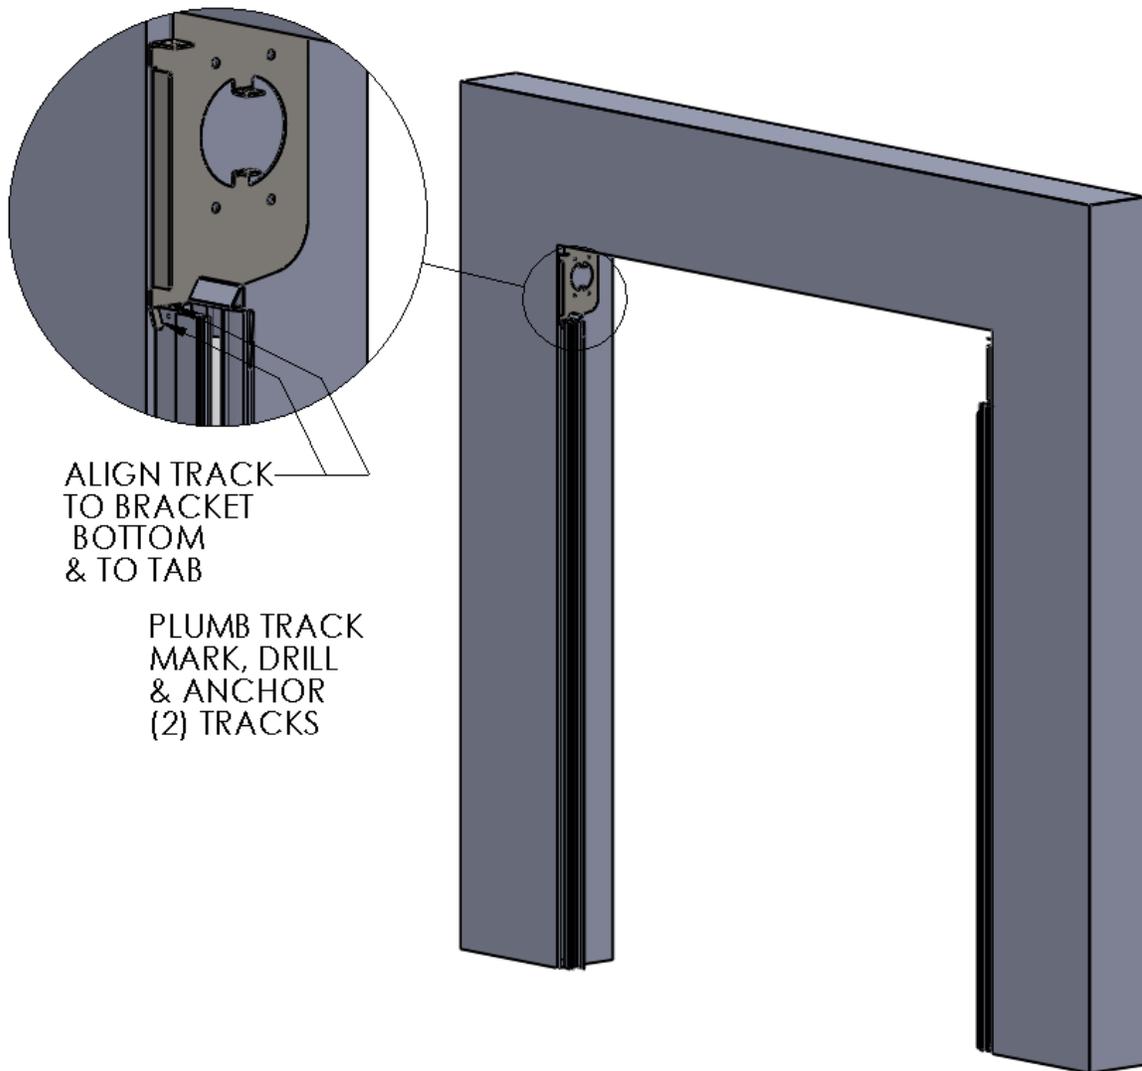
LOCATE, MARK, INSTALL TRACK ASSEMBLIES
